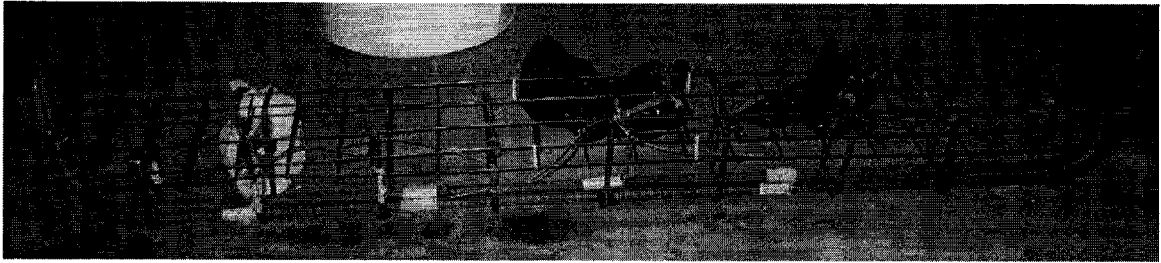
Typical reinforcement steel in the specimens strengthened in shear
